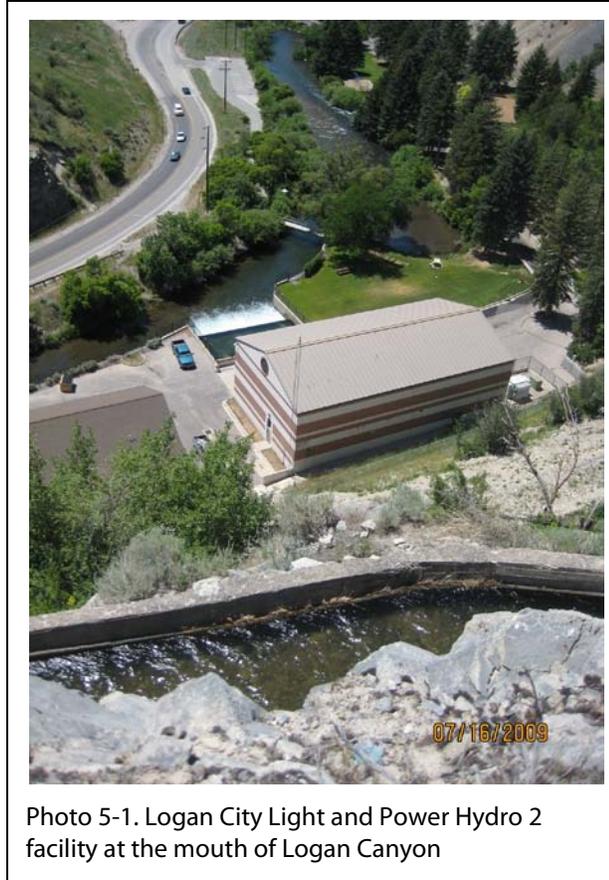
Logan City Light and Power Hydro 2 facility at the mouth of Logan Canyon
